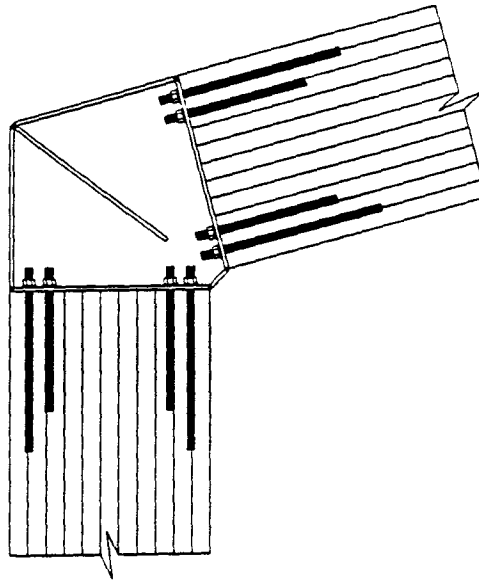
Knee joint using structural steel bracket, Townsend, Buchanan (1990)
